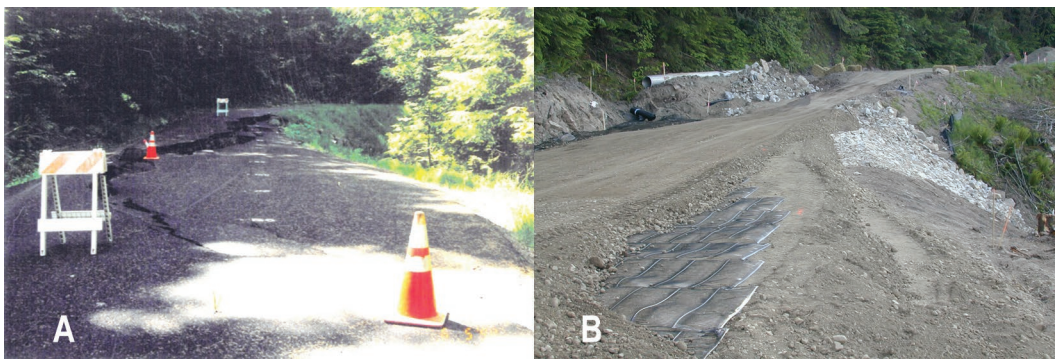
Gifford Pinchot, Road 26, MP 1.1: a) preconstruction photo, b) construction photo.
